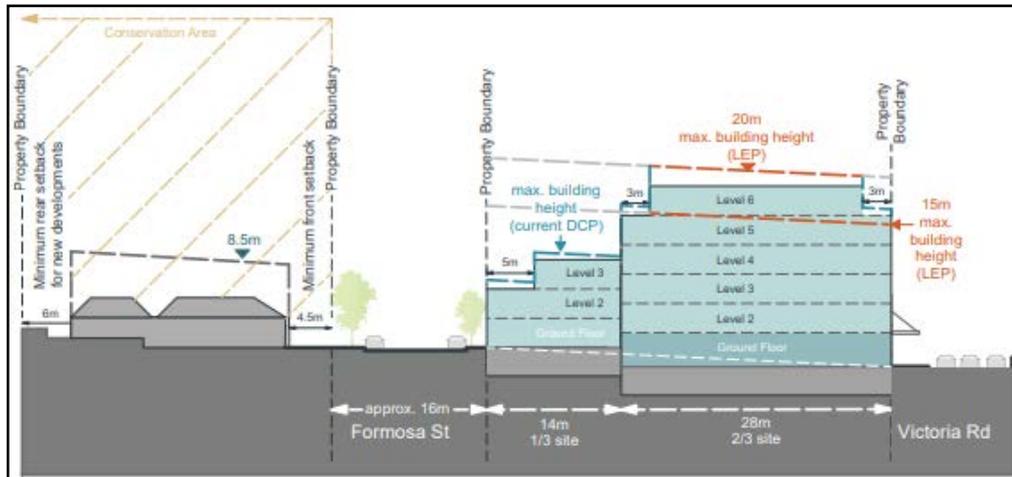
Sectional view showing existing LEP maximum building height controls on the western side of Victoria Road.
